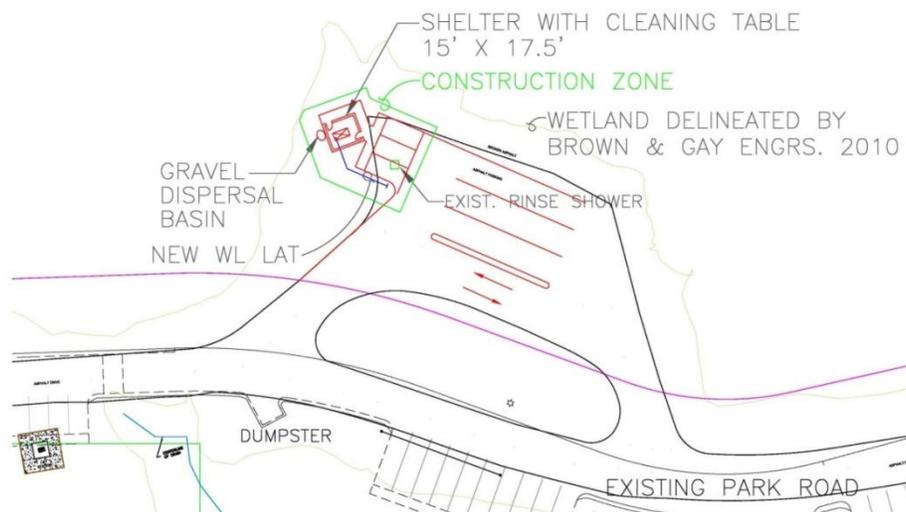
Site plan for the fish cleaning shelter and the location of existing development and environmental features.
